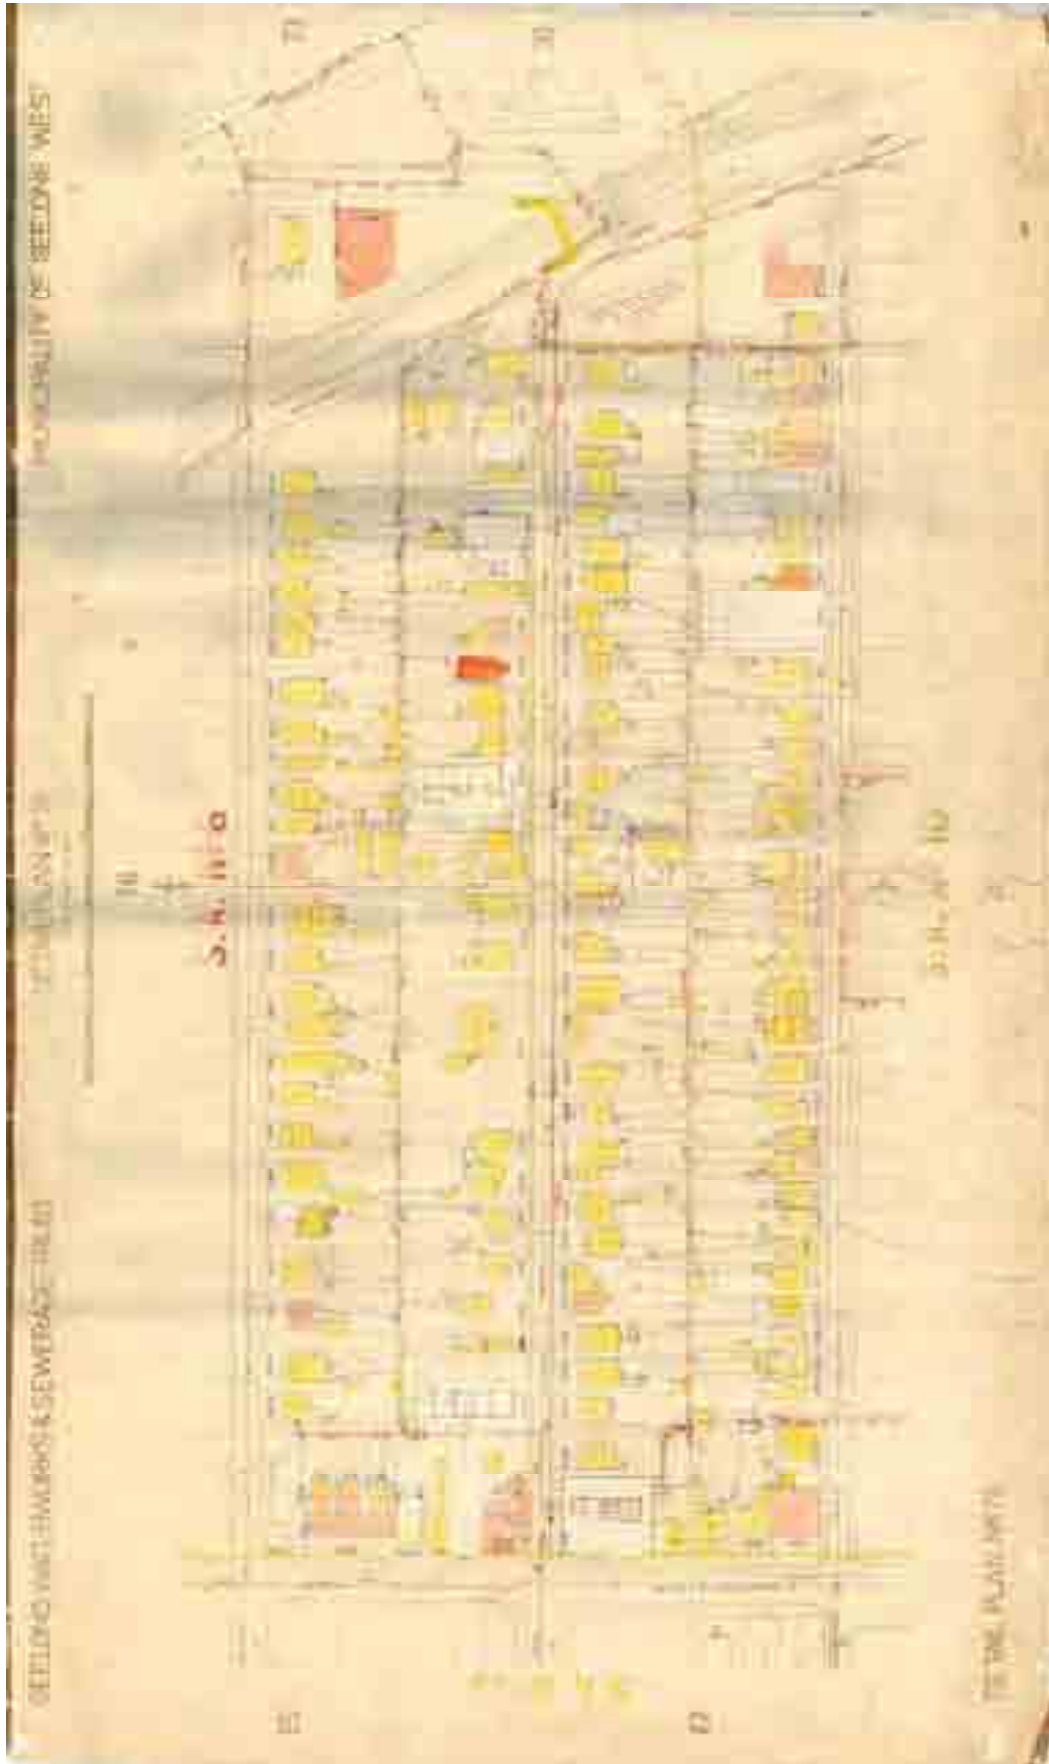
Geelong Waterworks & Sewerage Trust Detail Plan No. 75, 1958. Source: Barwon Water collection.
